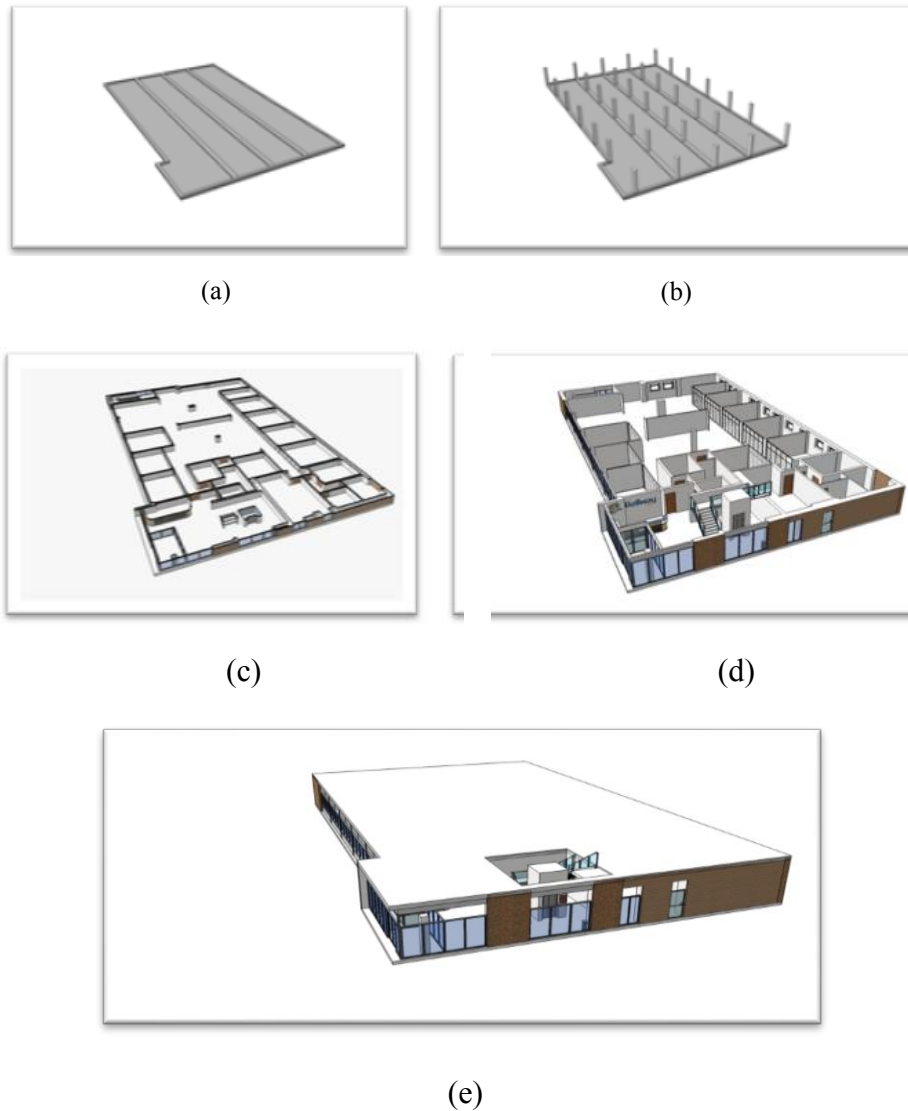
3D animation frames: (a) the Raft foundation, (b) the basement columns, (c) the ground floor overview, (d) Internal details, (e) a bird-eye view.
